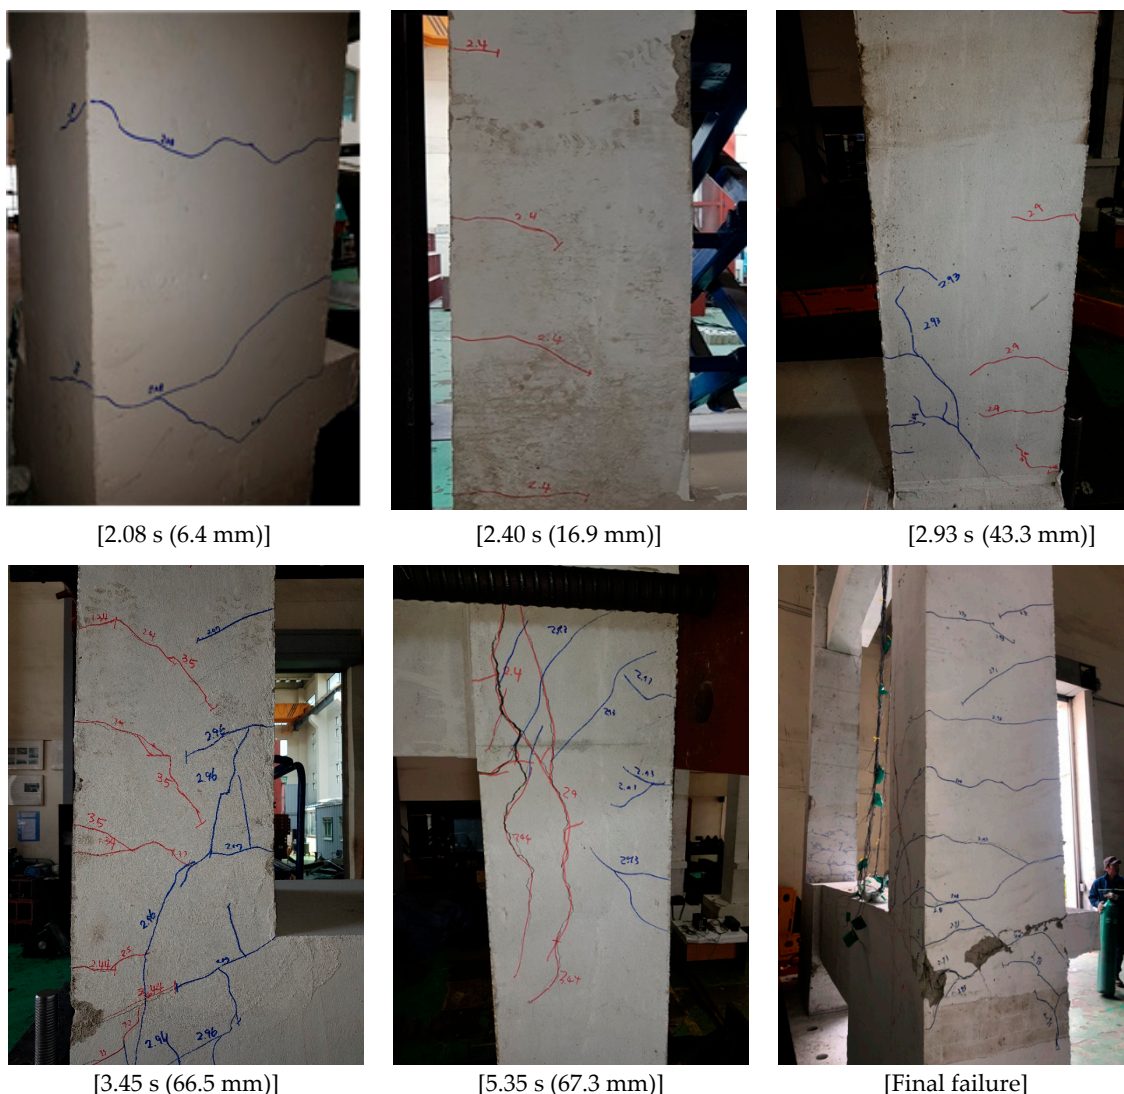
Cracks and final failures of non-strengthened frame specimen (PD-FR) (200 cm/s^2).
